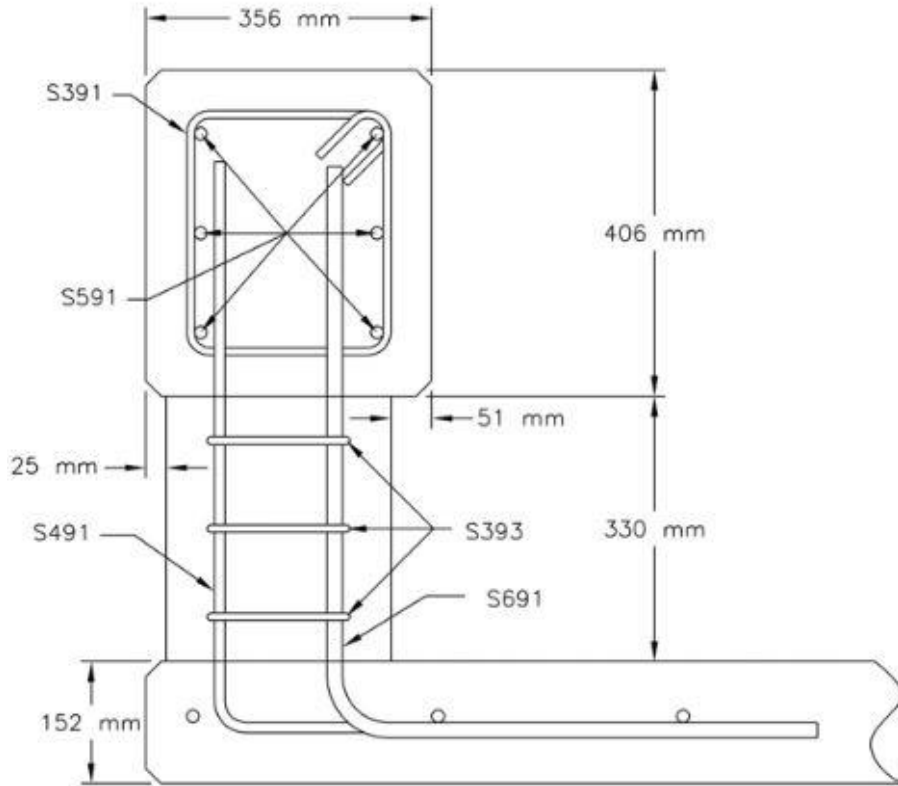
Nebraska Open Concrete Rail on an IT Bridge Deck System Drawing [1]
